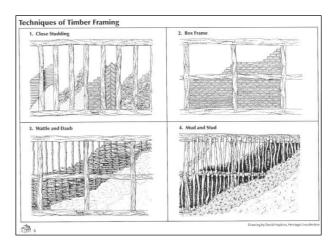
The 'Lincolnshire style' of wattle-and-daub walling (bottom right), taken from Lincolnshire Buildings in the Mud and Stud Tradition and showing where the main timbers were spanned by willow lathes and nailed (a detail rarely seen outside Lincolnshire). 'Puddled' mud mixed with chopped straw would have then been daubed onto the framework and, once dry, usually whitewashed. If done well such walling might last two generations before needing to be re-built. Timber was scarce (there are probably more trees in North Lincolnshire now than 500 years ago) and reused wherever possible.
